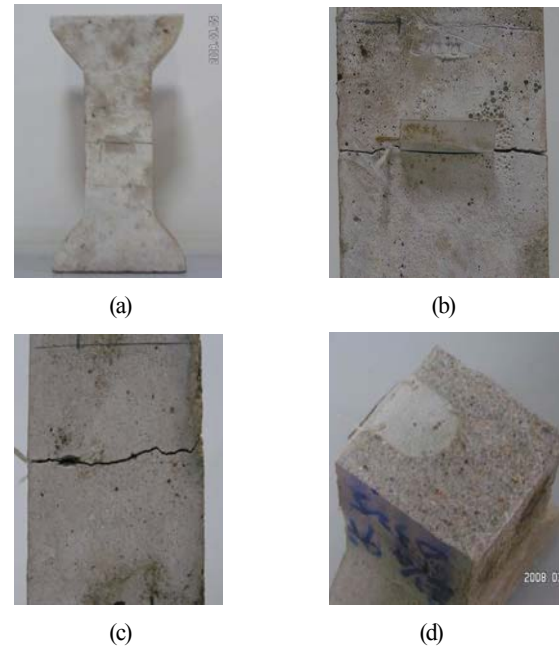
Failure states of sample with  $\alpha=90^\circ$ . (a): Fractured sample; (b): Fracture trace on front surface; (c): Fracture trace on back surface; (d): Fracture section
